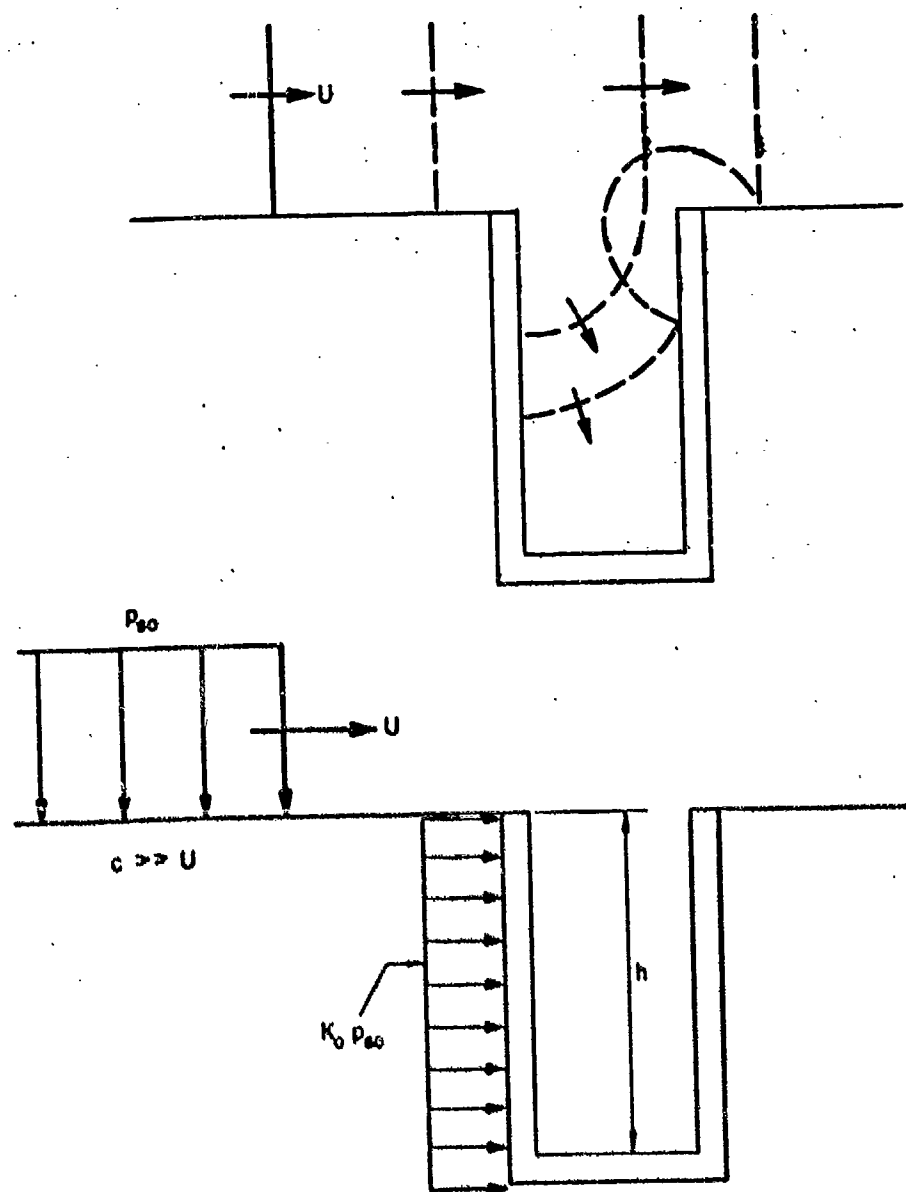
WALLS ADJACENT TO OPEN STAIRWELL
